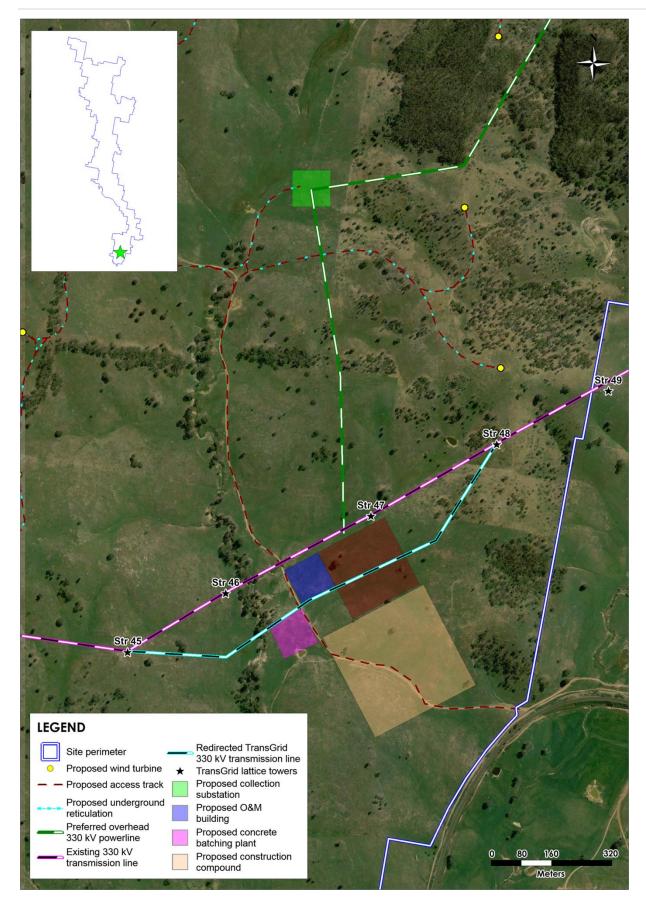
Proposed wind farm connection substation, collection substation, construction compound, line deviation route, concrete batch plant & permanent operation and maintenance facility
